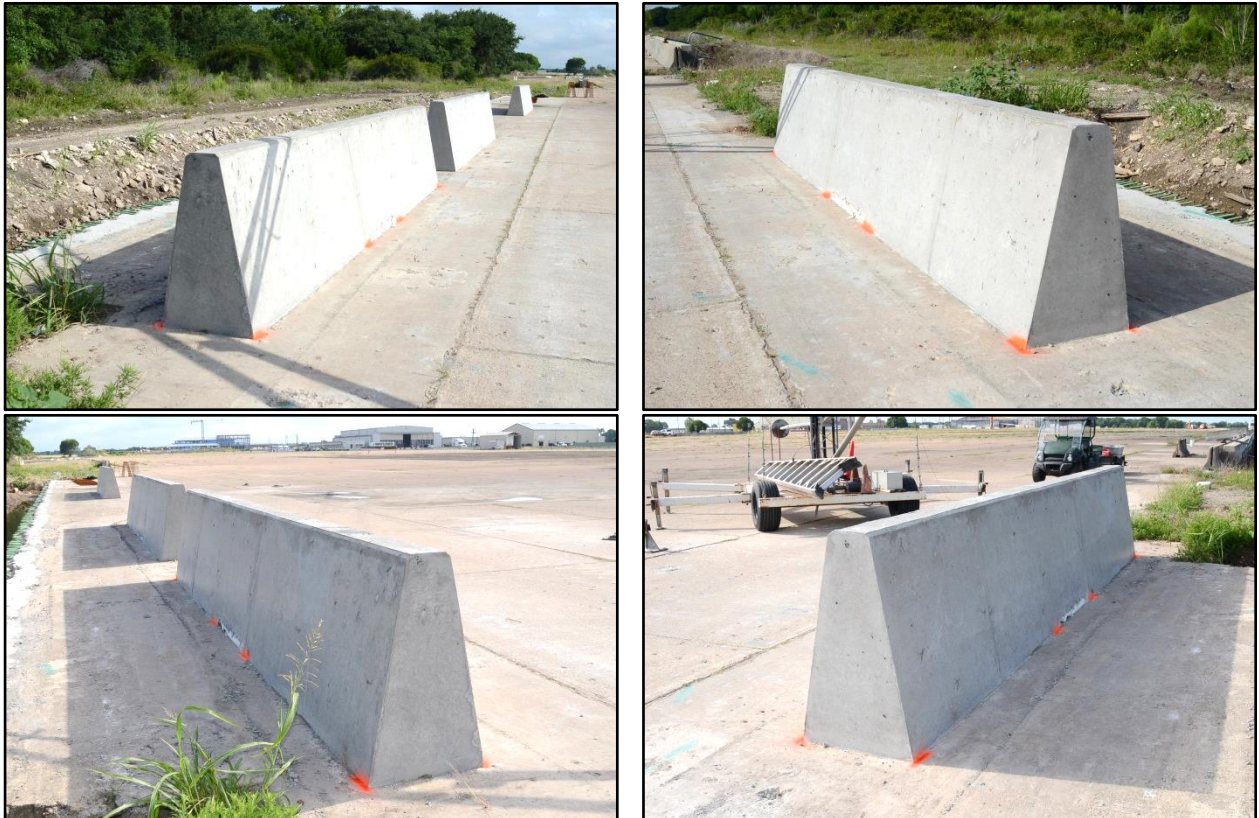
TxDOT Class C Concrete Barrier before Test No. 468957-B8.
